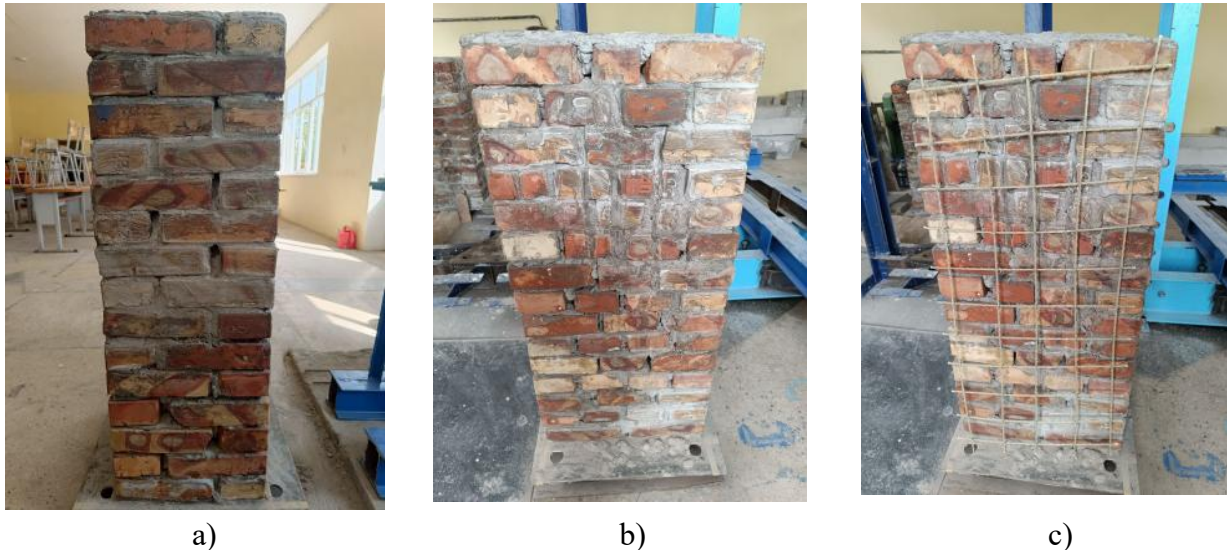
General view of experimental brick column specimens. Reference specimens (a, b) and strengthened specimen/prototype (c)
